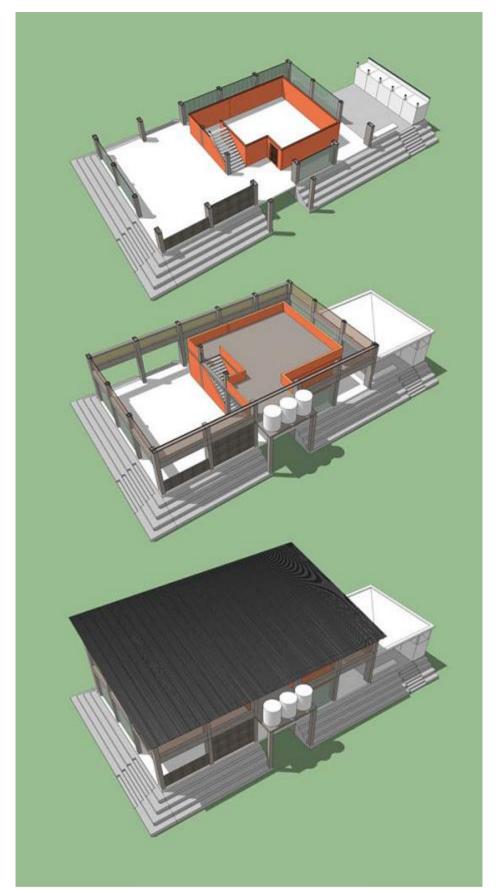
Design of building in Inhangoma; elevation, rain water harvesting, first floor level, additional sanitation (Caia, 2009/2010)
